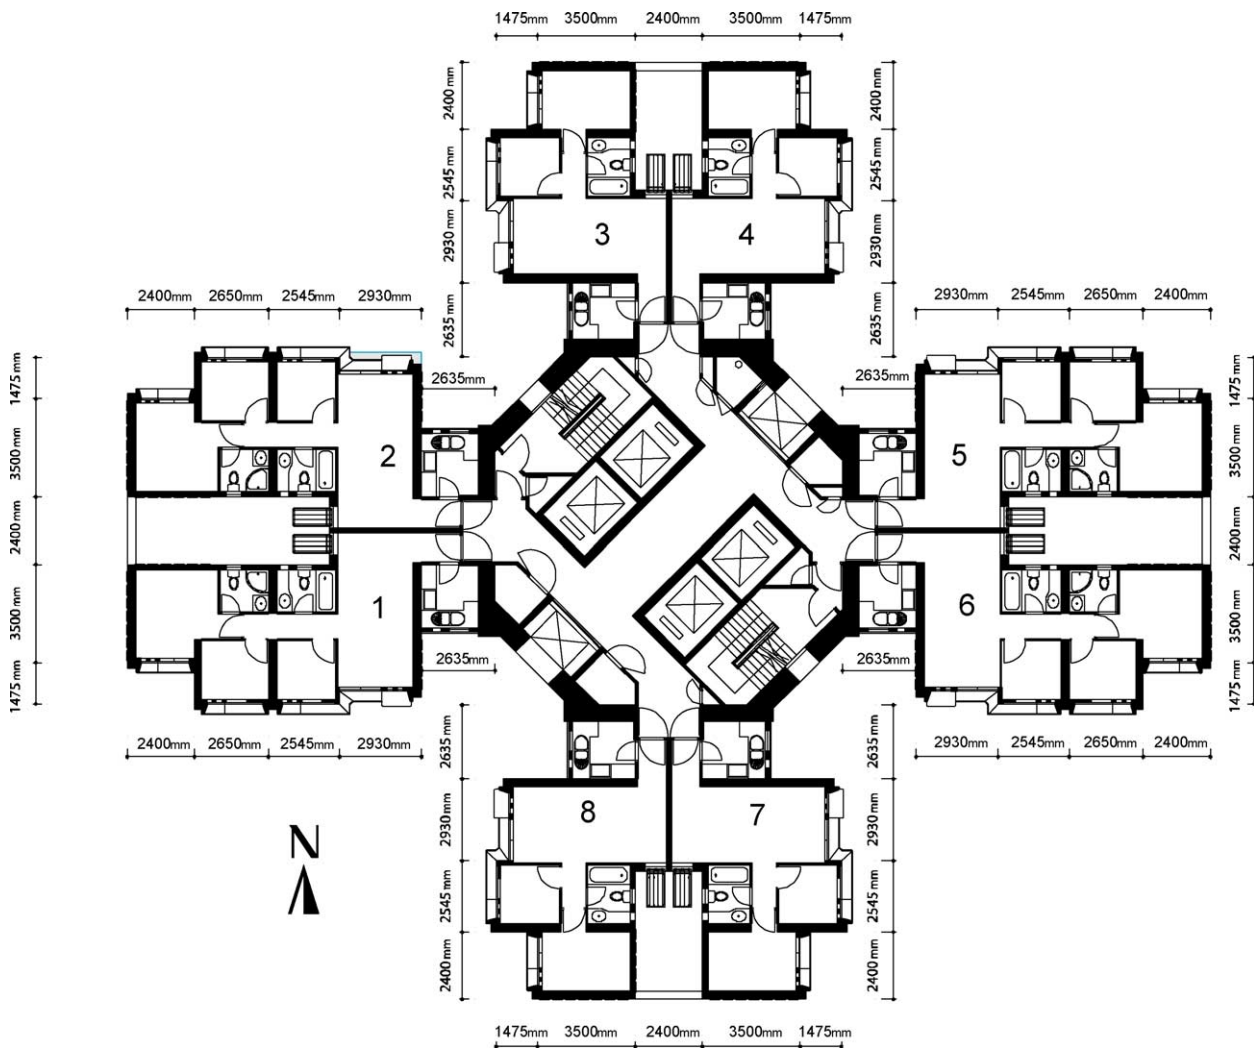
Typical floor plan of Concord Block (source: HKHA, 2001).
